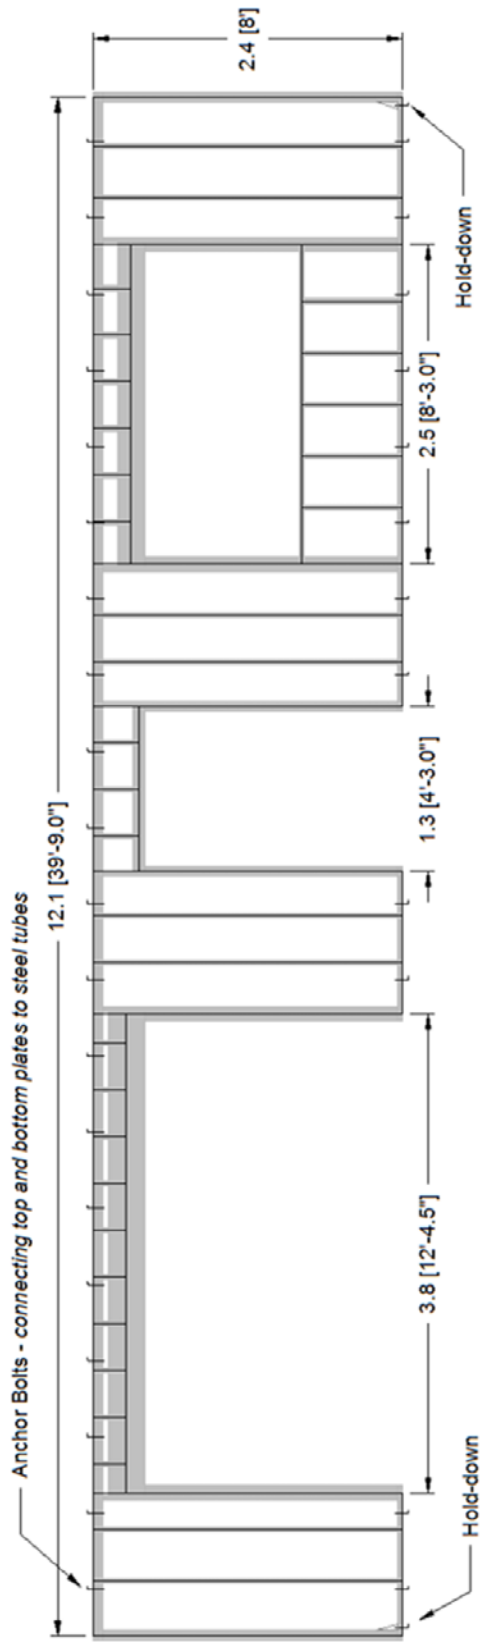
Example of Assumed Wall Framing with SAP2000 Wire Frame Overlay for Type D Shear Wall – Dimensions are in (ft-in)
